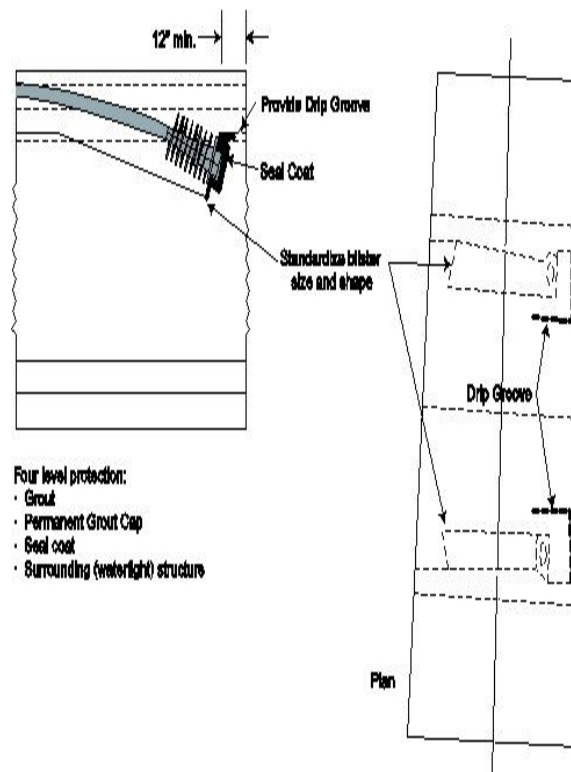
Anchor protection for cantilever tendons anchored in blisters
